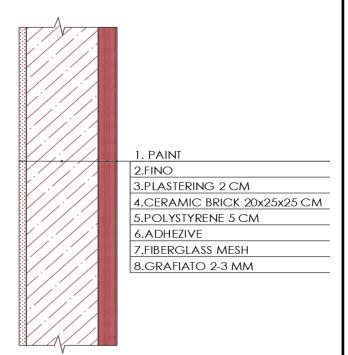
Building B masonry composition, CAD, Source: Authors.
